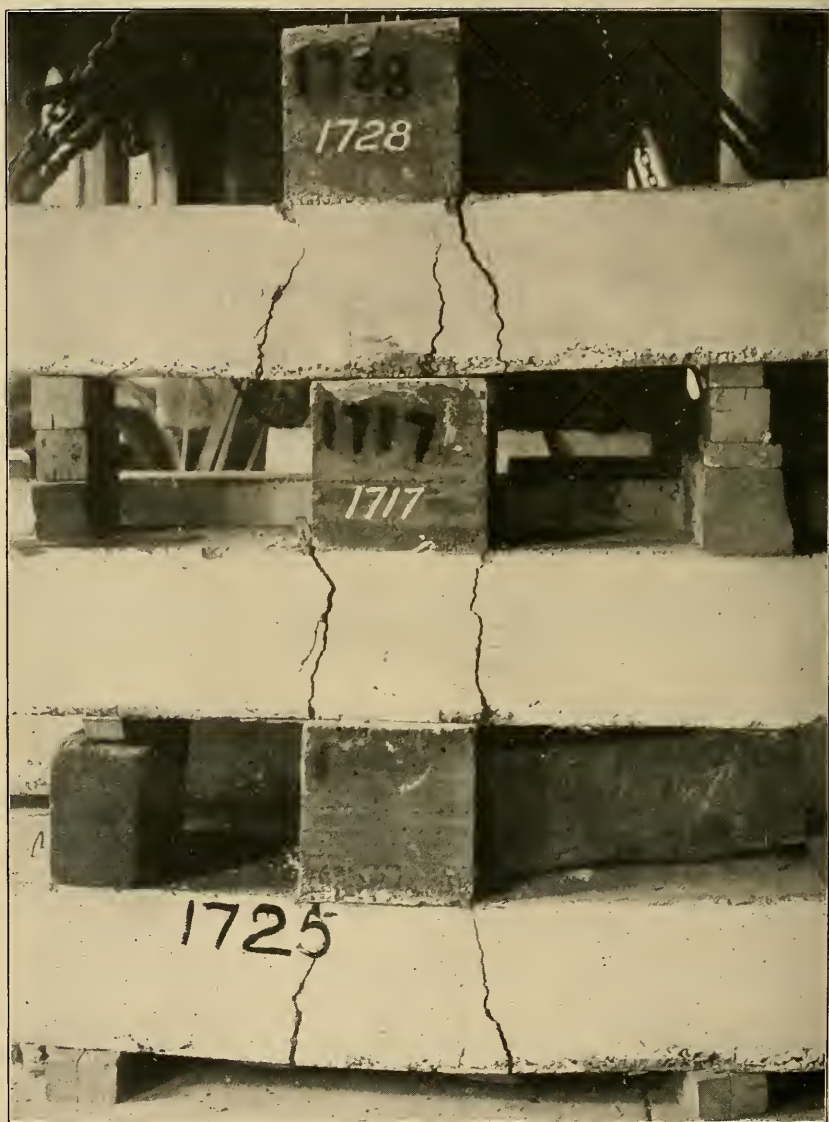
VIEWS OF REINFORCED CONCRETE WALL FOOTINGS AFTER TEST.
